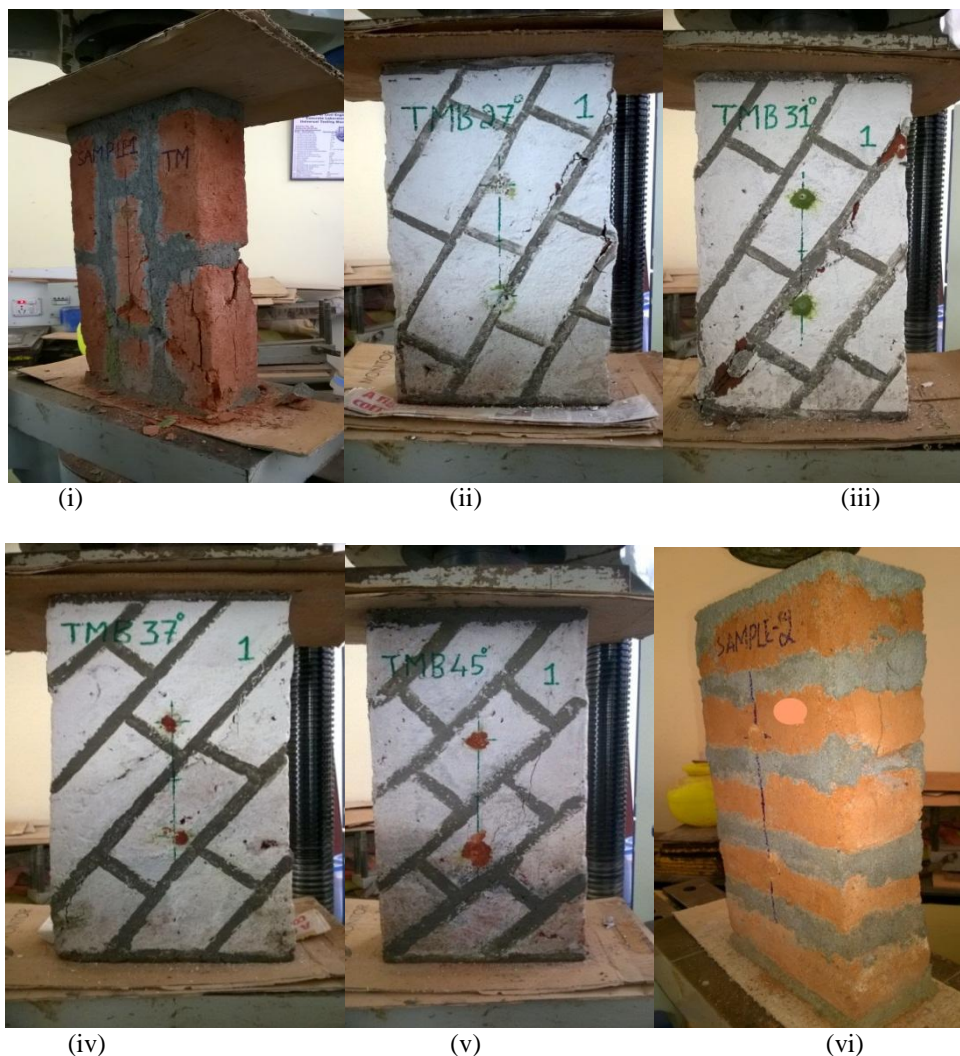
Failure Specimens of TMBPs At Loading Angles (i) Parallel to bed joint(ii) 27° to bed joint(iii) 31° to bed joint (iv) 37° to bed joint (v) 45° to bed joint (vi) Perpendicular to bed joint.
